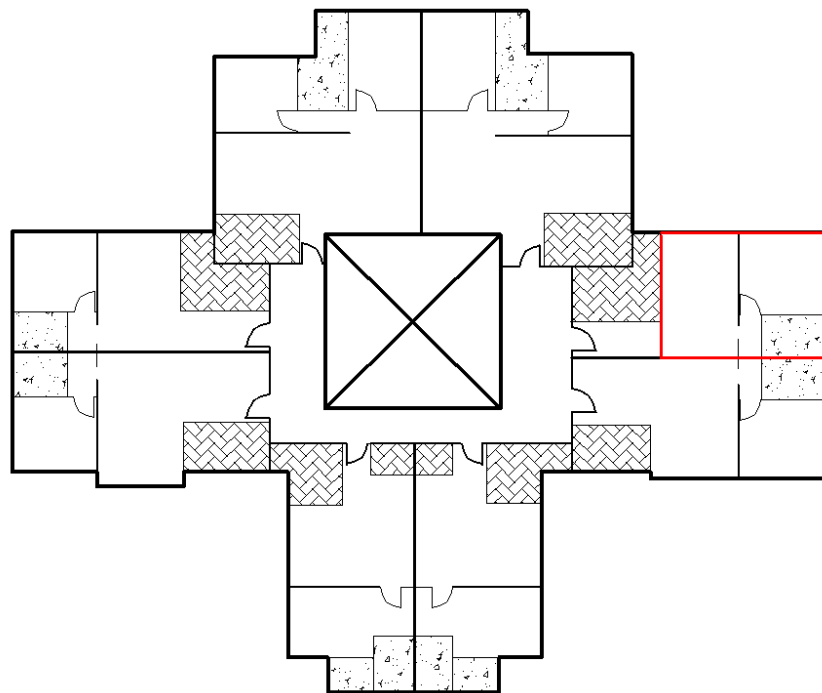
Typical floor layout of Phrased 1 and 2 of MF
